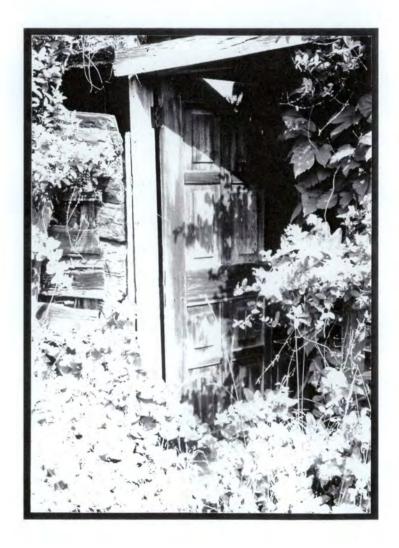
SAMUEL BROWN HOUSE (#9),SOUTHEAST FRONT ELEVATION DETAIL
